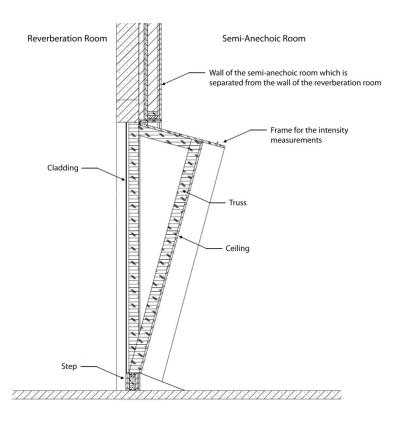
Rough cross-section of the roof system installed in the opening between a reverberation room and a semi-anechoic room.
